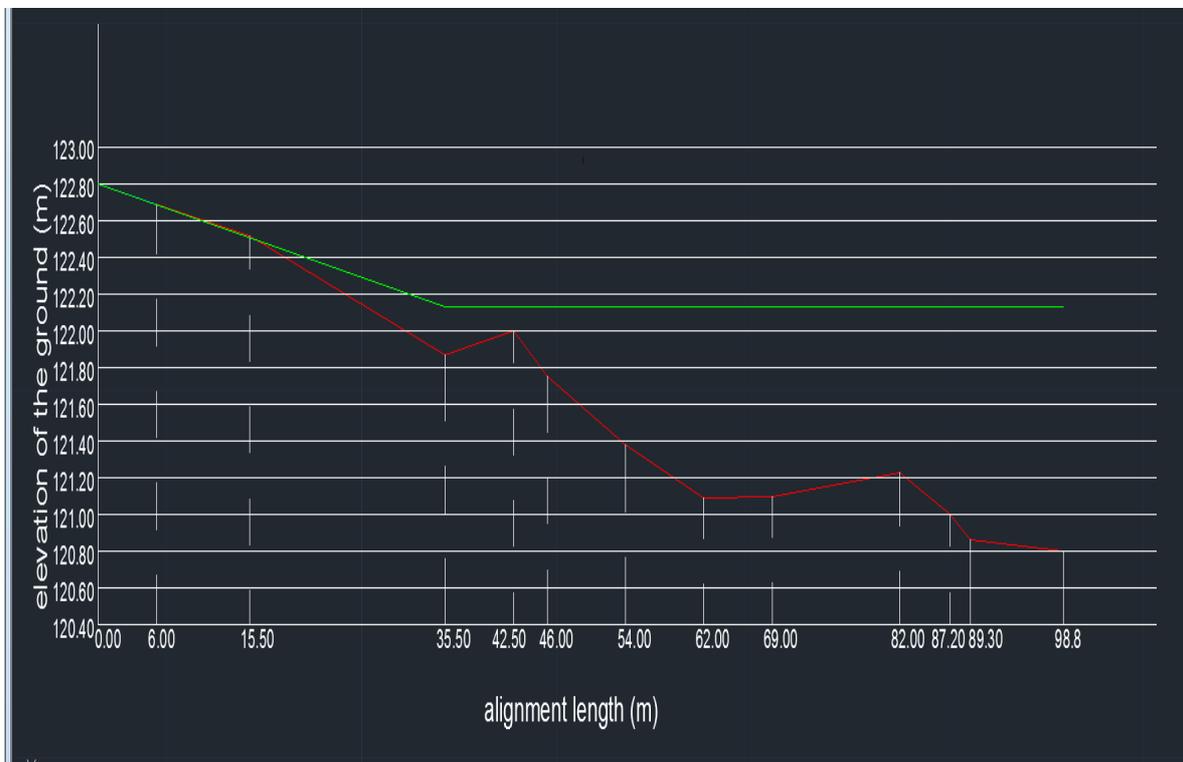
Longitudinal Profile of the proposed alignment (red line shows ground and green line shows elevation of the proposed alignment)
